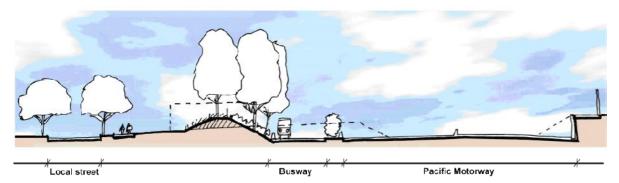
Typical cross-section through Precinct 1 — Strategy 1
